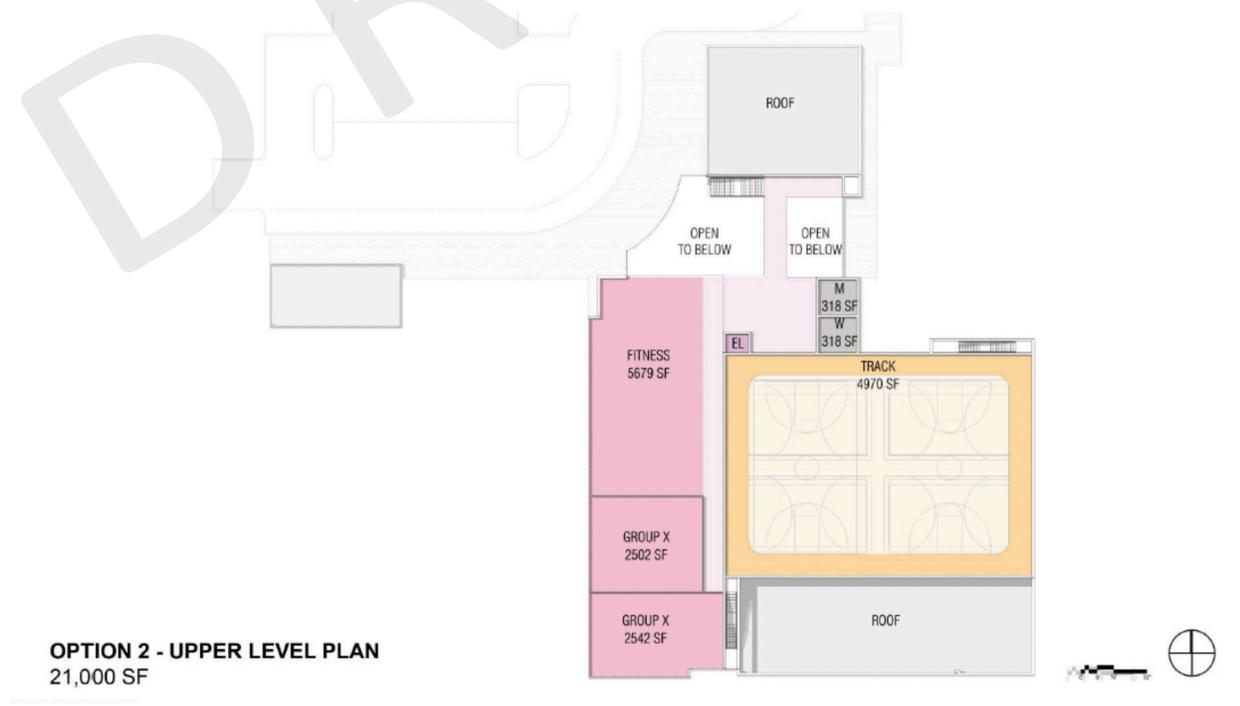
shows the potential second floor plan for the renovation resulting in a 74,100 sq. ft. facility.
